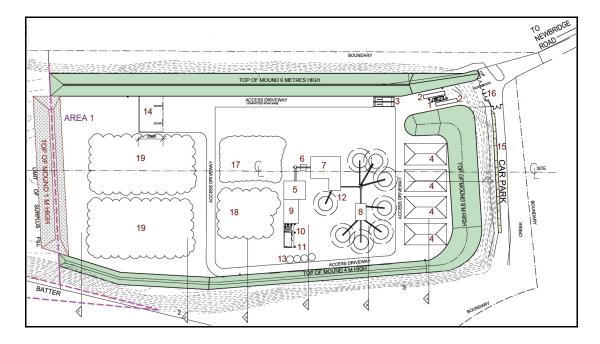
Extract from the revised Site Layout Plan. Numbers referred to in the plan are detailed below.
